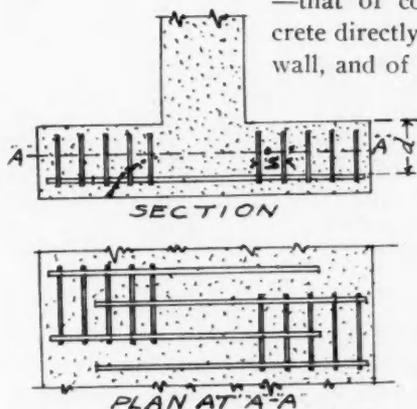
Wall Footing Reinforced with Bars and Stirrups
